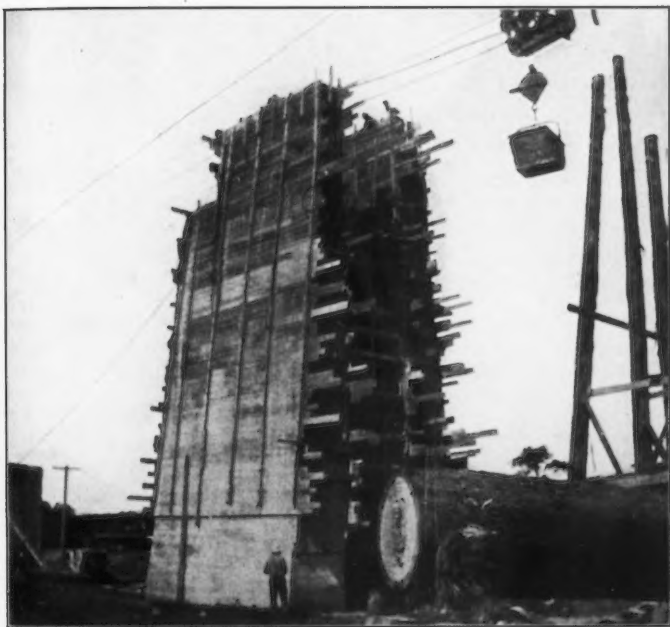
SOUTH ABUTMENT, SHOWING METHOD OF PLACING CONCRETE IN FINISHING ABUTMENT. TOTAL HEIGHT, 57 FT. (ABOVE GROUND, 45 FT.)
